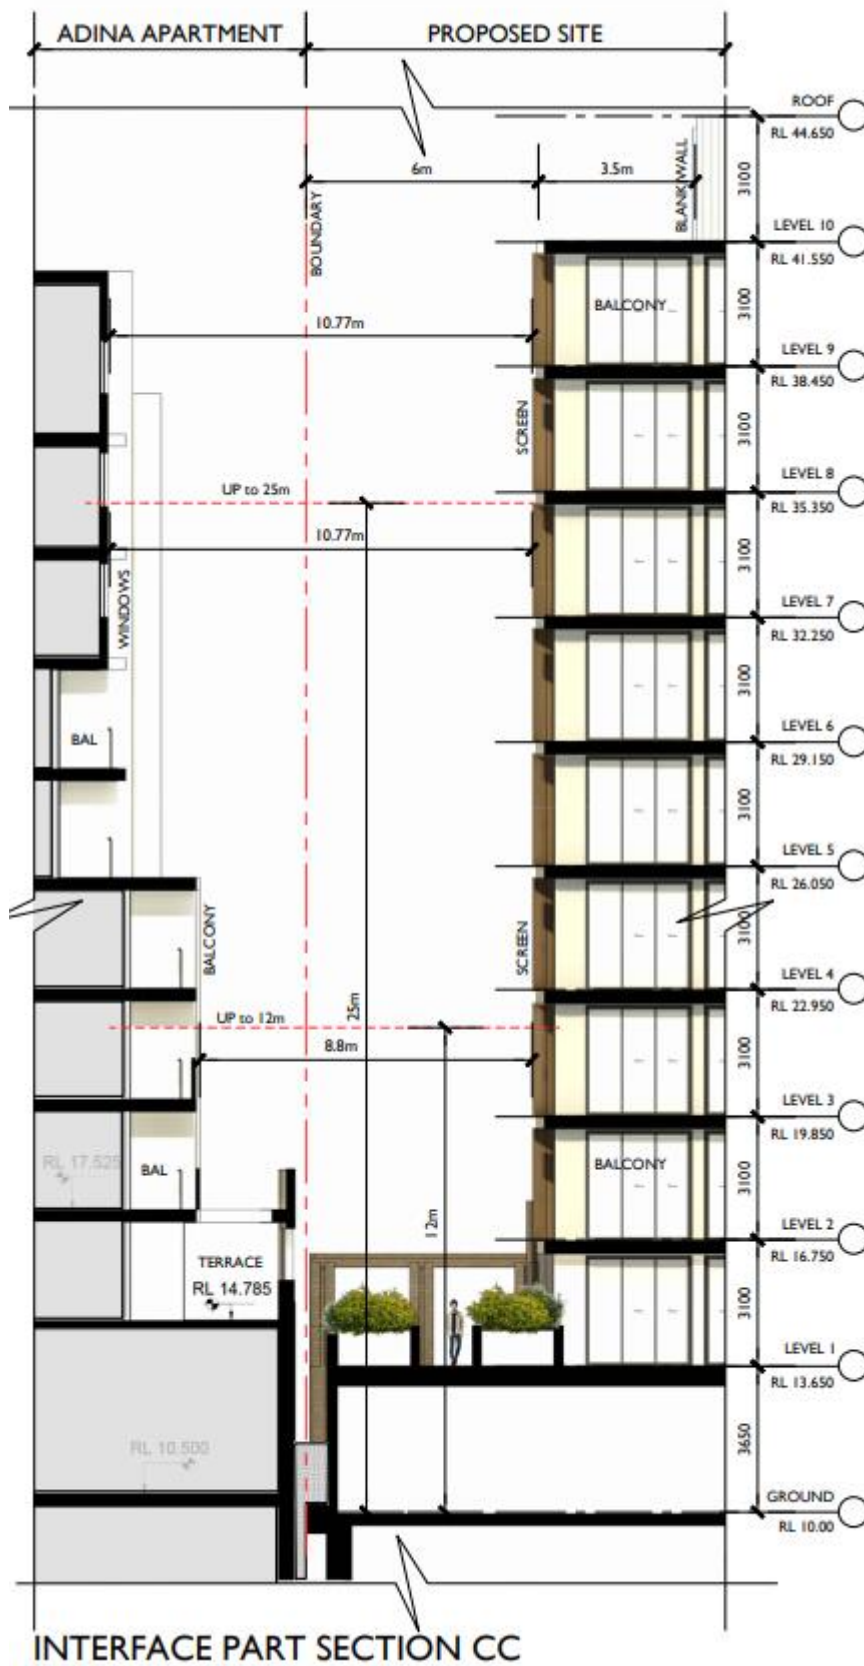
Interface Section prepared by ADM Architects showing separation between the proposed building and the Adina building to the north.
